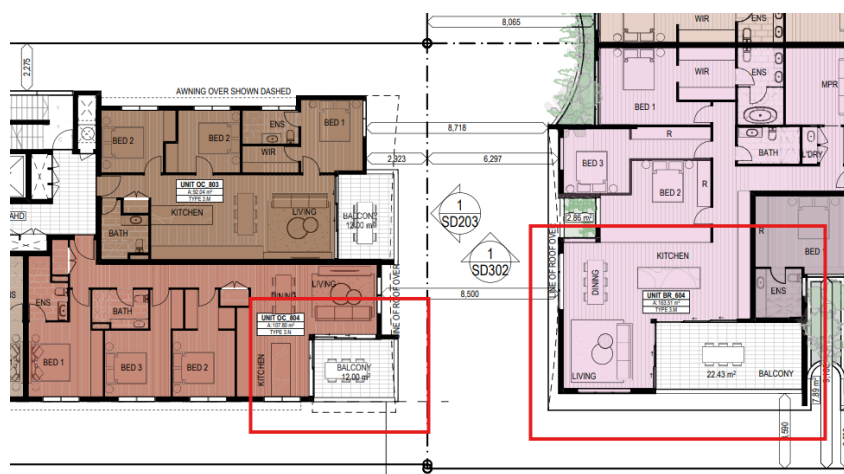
Revised Private Open Space Outcome - O'Connell Street Tower
